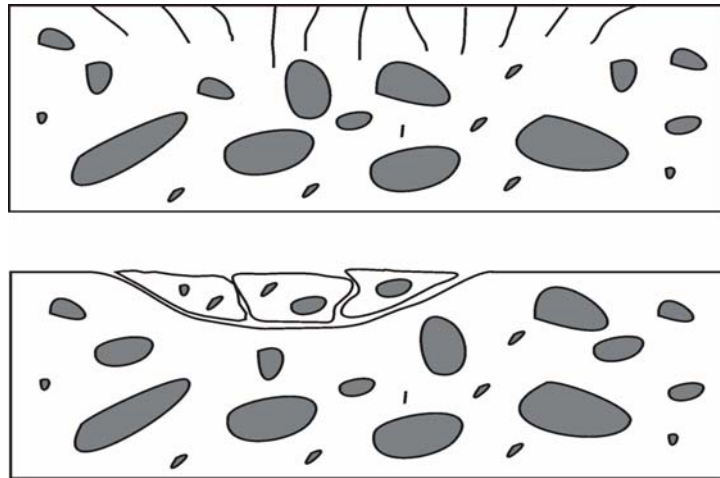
Microcracking and spalling of concrete substrate
